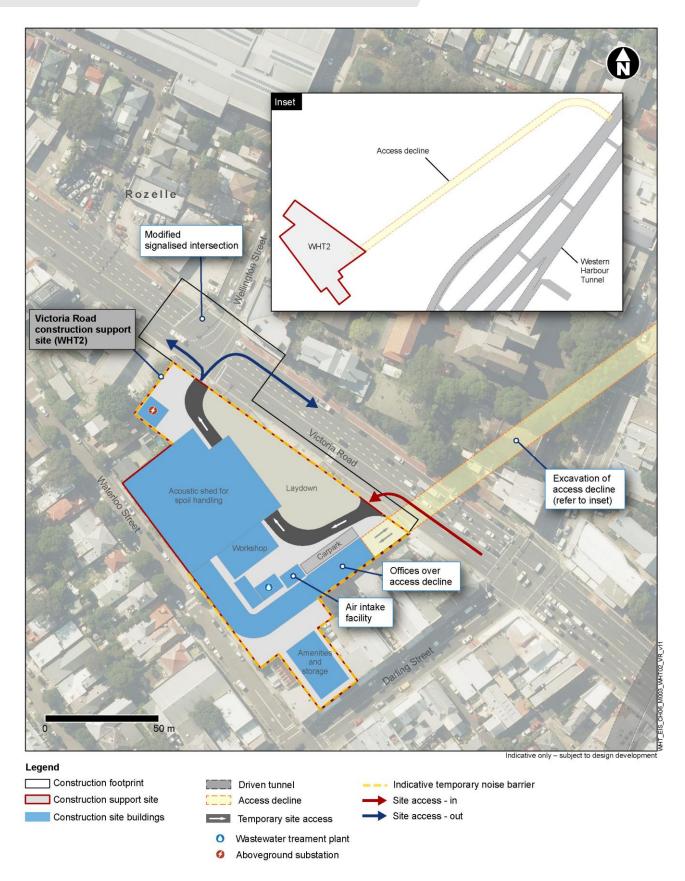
Indicative construction support site layout – WHT2 – Victoria Road
